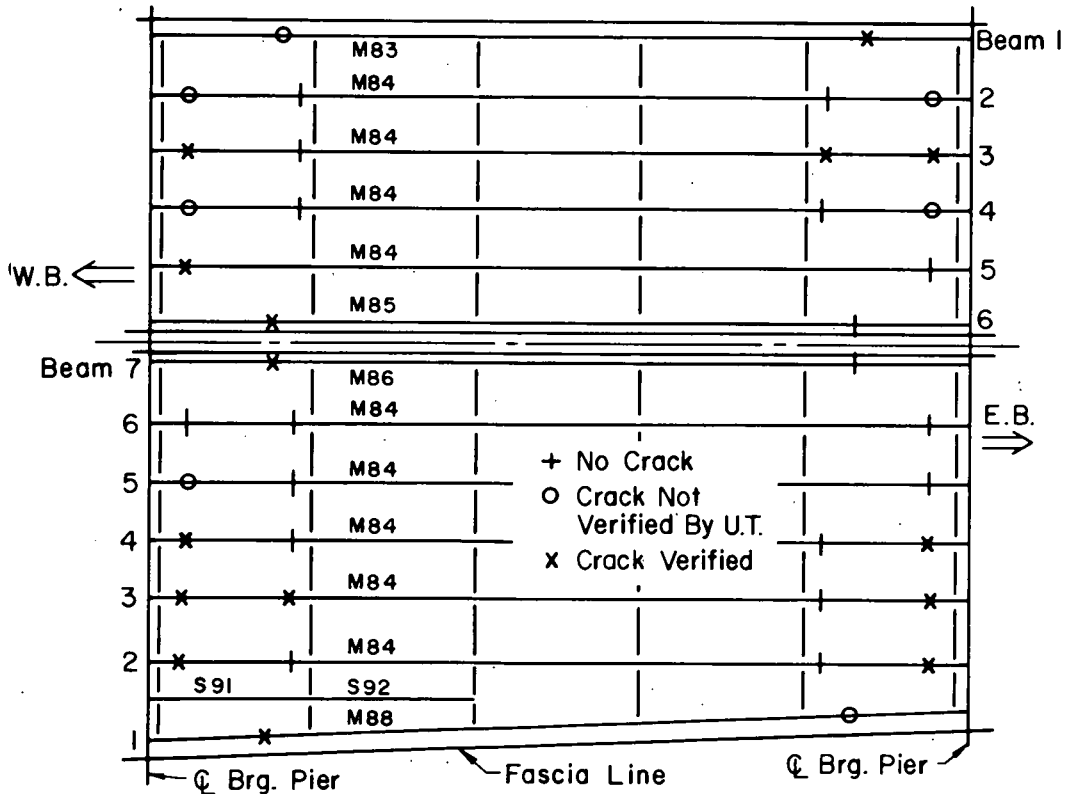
Plan of inspected details in span No. 10, Yellow Mill Pond Bridge.
